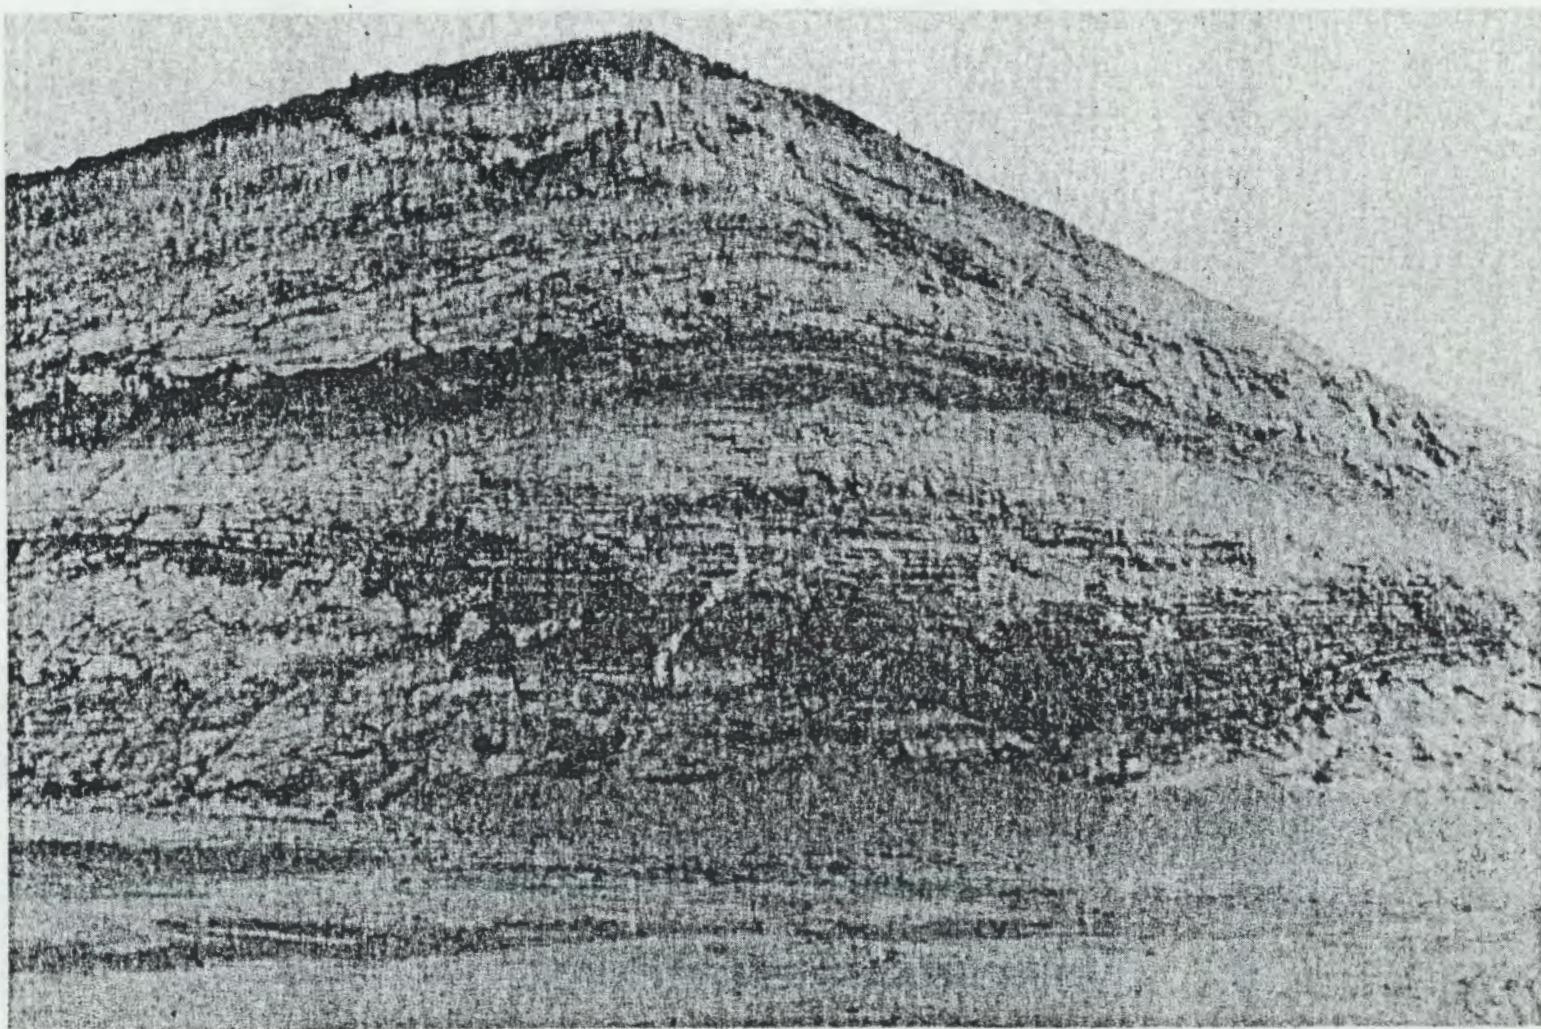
1704 Pit at Morton Ranch. Clay liner material taken from shale and siltstone material similar to that seen exposed on pit wall.
